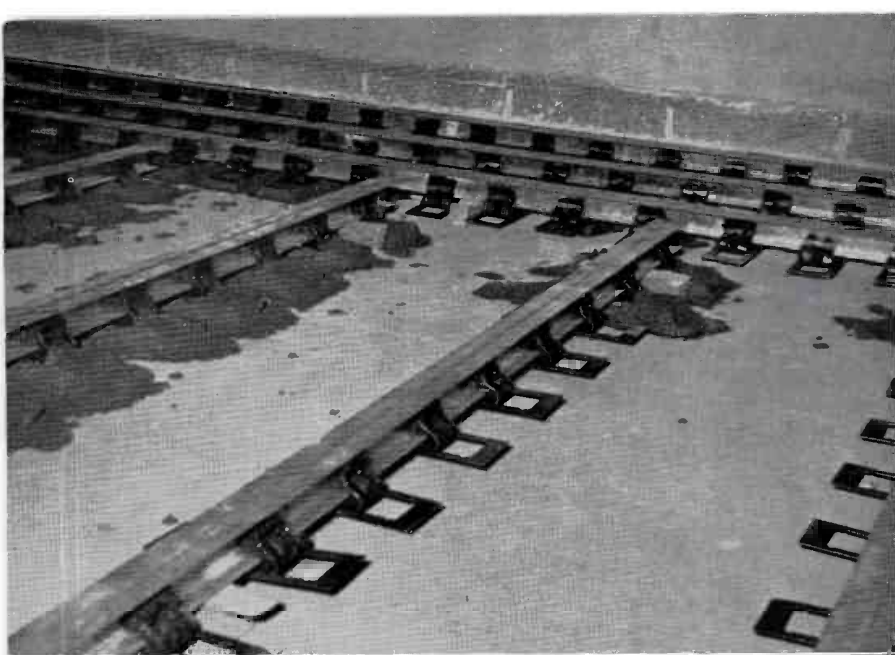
(left, upper). Typical studio floor isolation system consisting of steel H sleepers and J. M. chairs with punched felt isolation. After leveling, chairs are grouted to structural floor.
